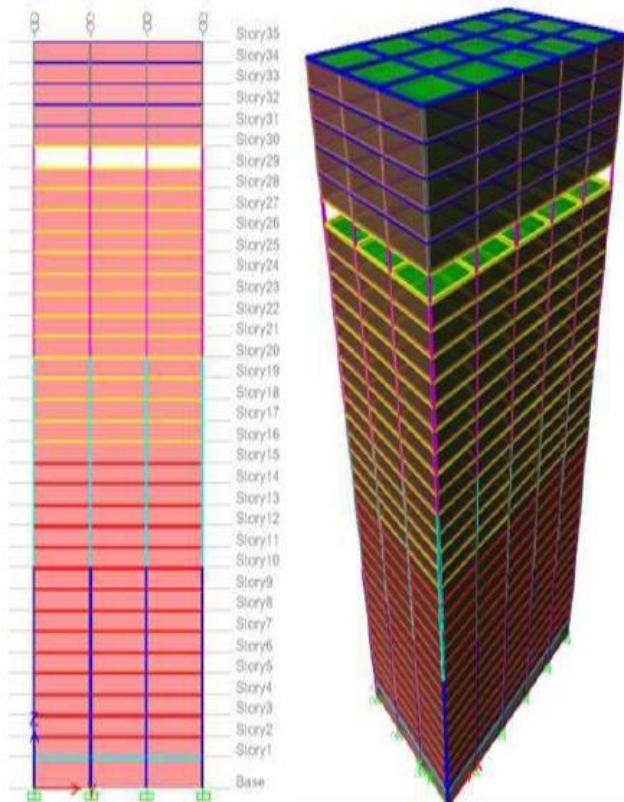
Elevation and 3D model of the soft storey at 30th floor (M4)
